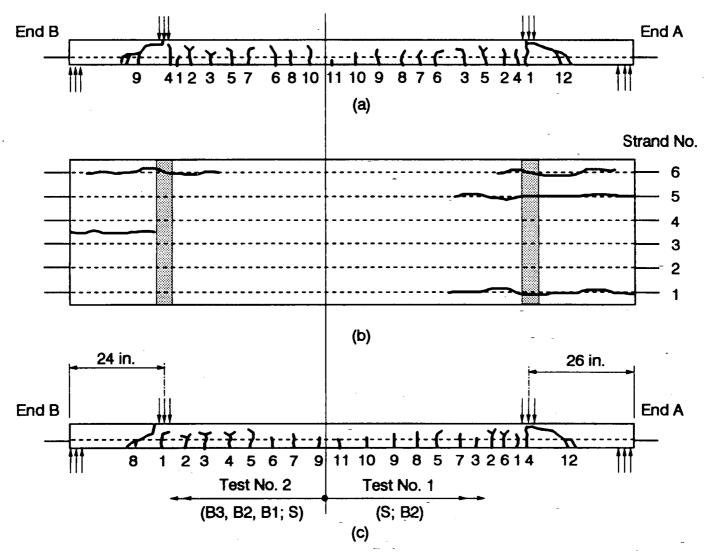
Crack patterns for D-type Specimen No. 9-6.0DC-1:
